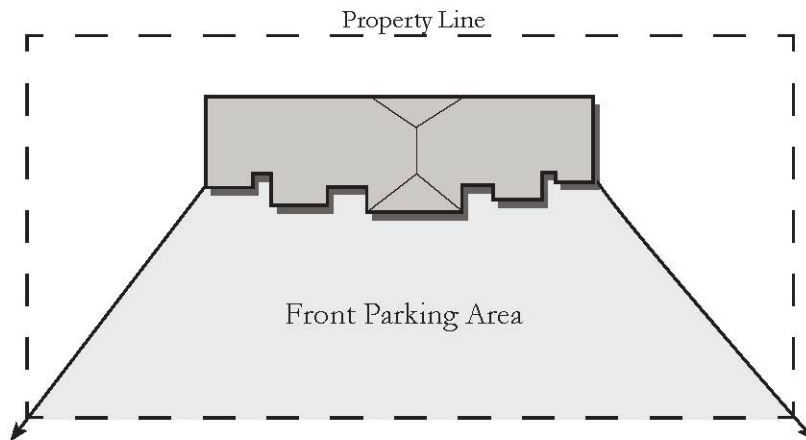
B(2): FRONT PARKING AREA
